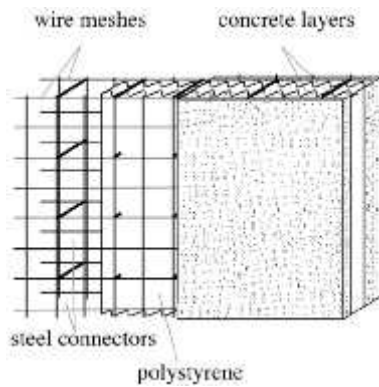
Schematic sketches of the components of wall and floor sandwich panels
